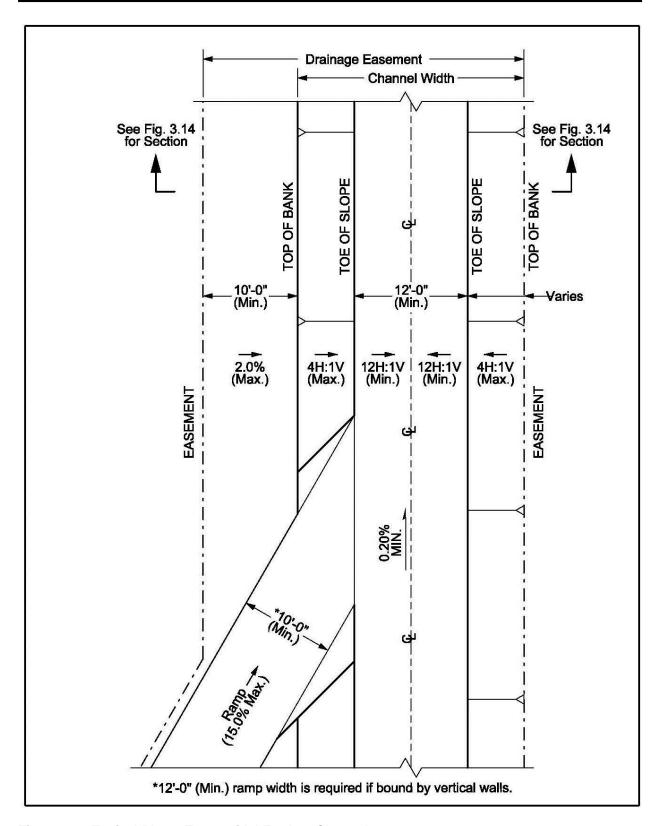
Typical Plan – Trapezoidal Earthen Channel
